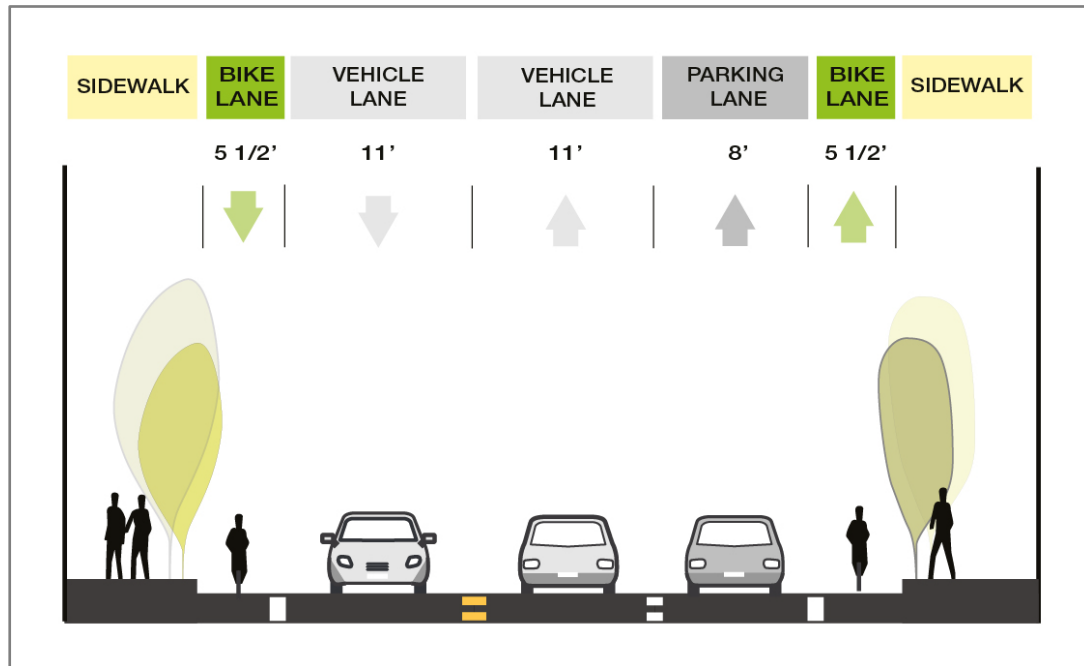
Subarea 2 Alternative 2 Cross Section Diagram
